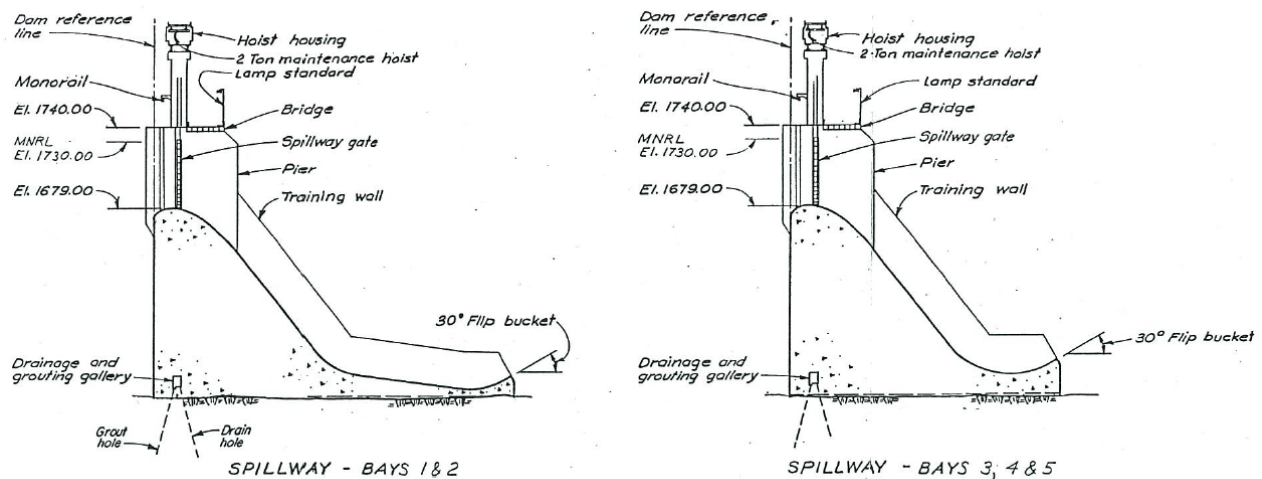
Seven Mile Dam spillway cross sections (BCH Report No. H1743).
